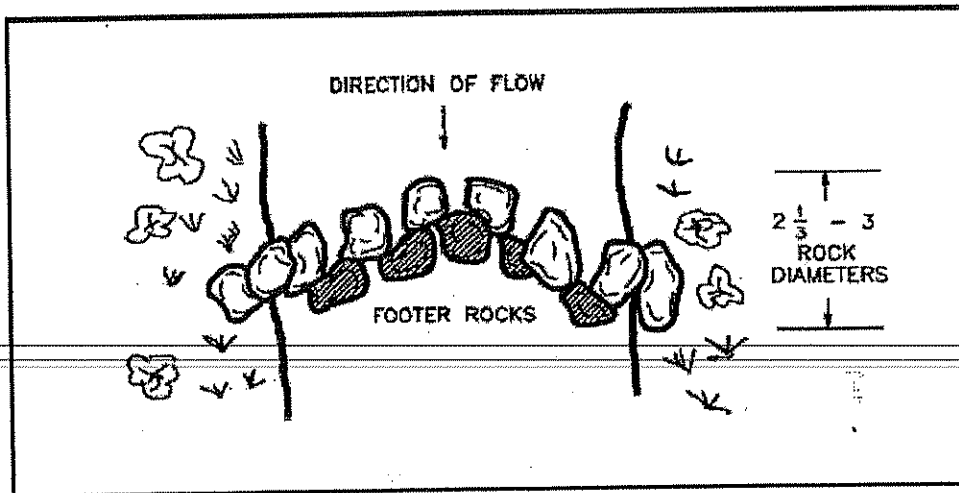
Vortex boulder weir, plan view (Rosgen, 1993).
